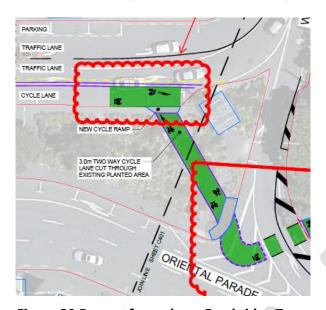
Excerpt from plan - Cambridge Terrace / Wakefield Street / Oriental Parade intersection (C303A)
